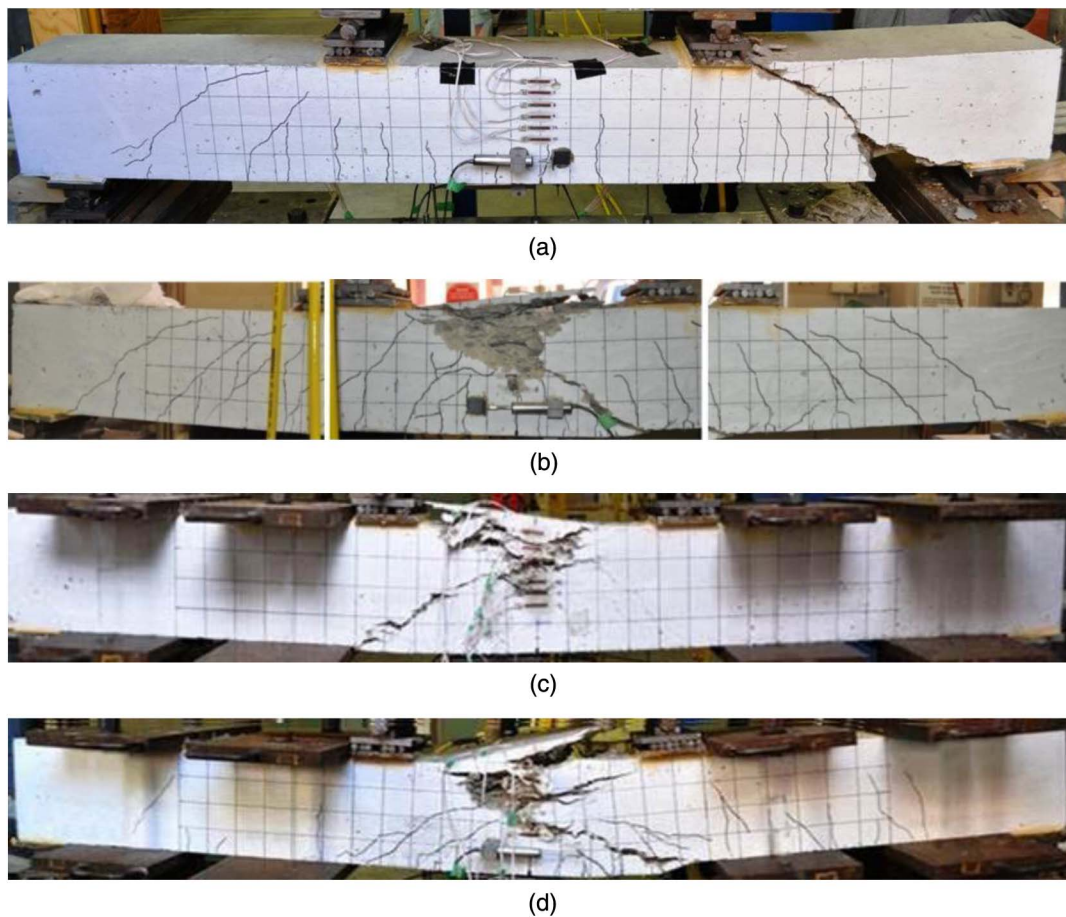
Failure modes of beam specimens: (a) FRC-6-1; (b) FRC-6-2; (c) FRC-12-1; and (d) FRC-12-2.
